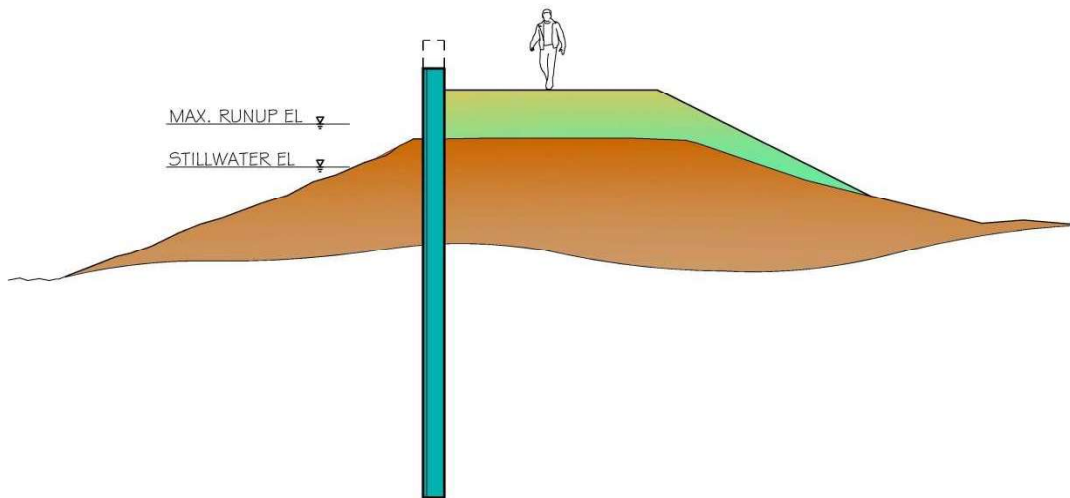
Typical Sheet Pile Floodwall Improvement Type
